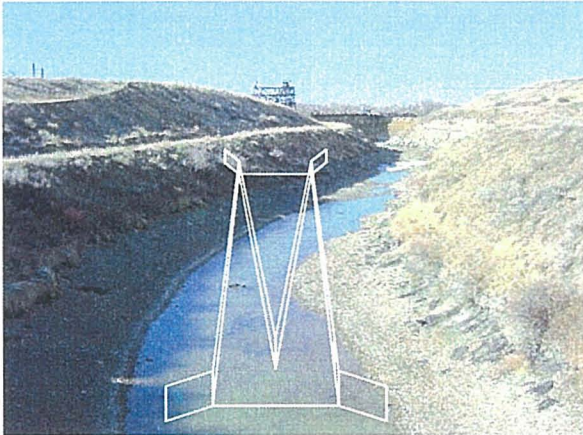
View looking upstream toward the Main canal headworks. Photo was taken from the access bridge to the Intake boat launch and recreation area. Outline of the screen structure shows the approximate location.
